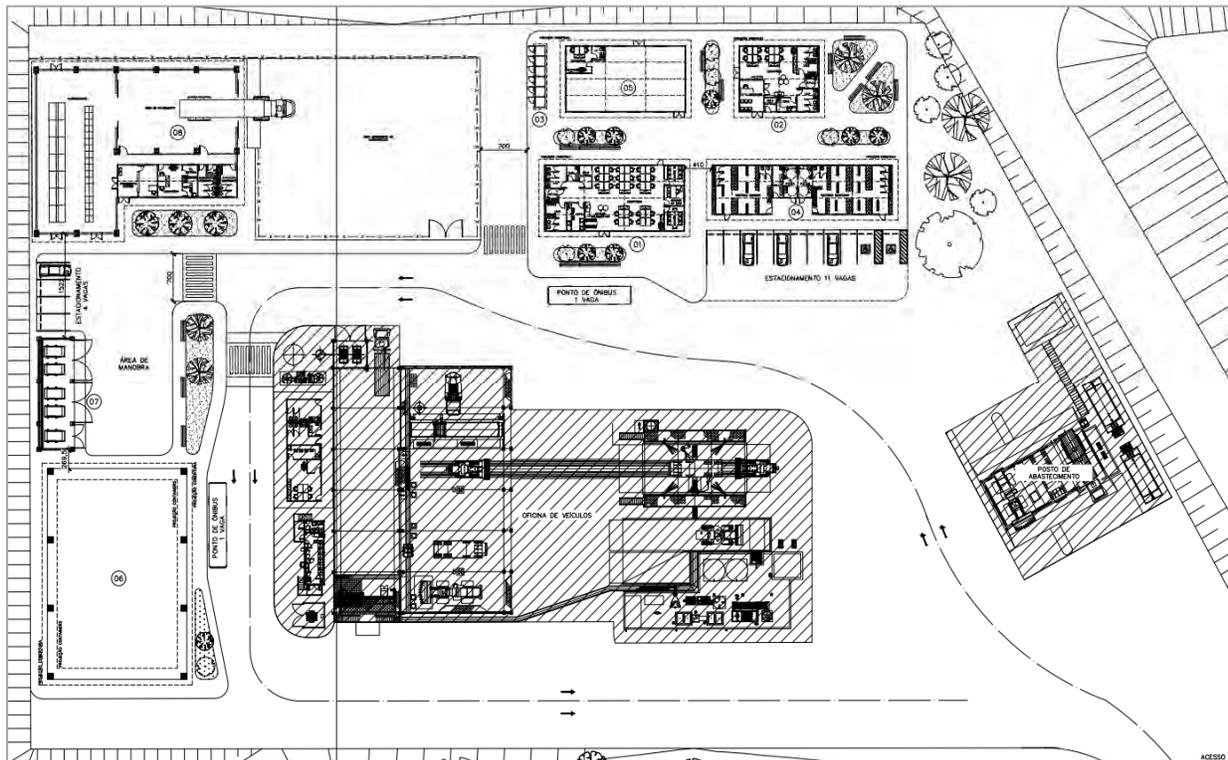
Laboratory, Warehouse, and Mine Support Plateau
